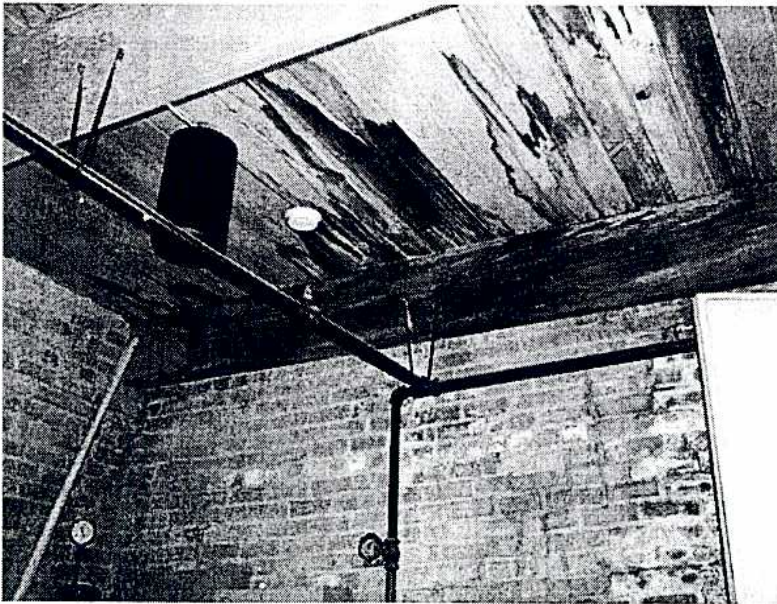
Staining and potential decay of wood beam at top floor of northeast stair tower
